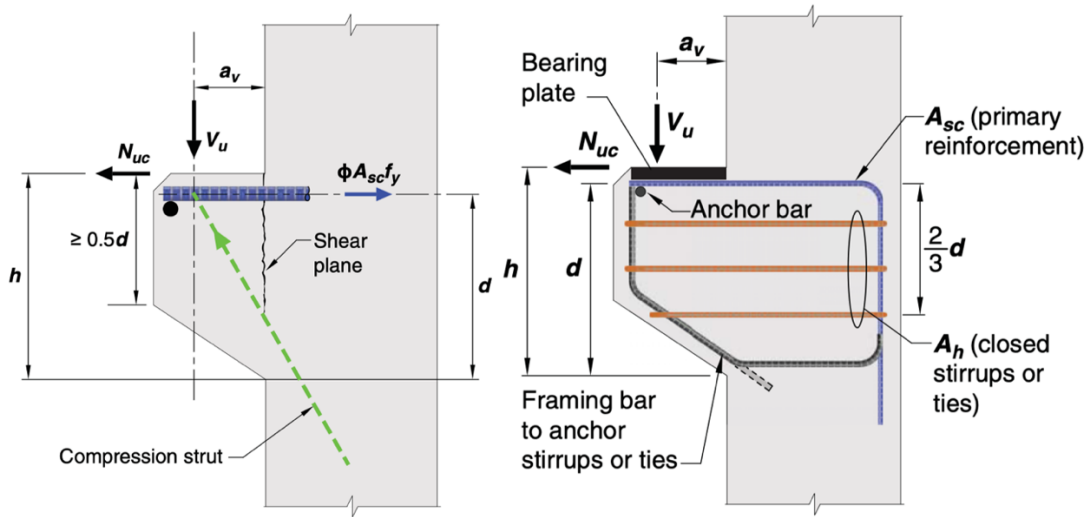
Design of corbels (American Concrete Institute, 2019)
